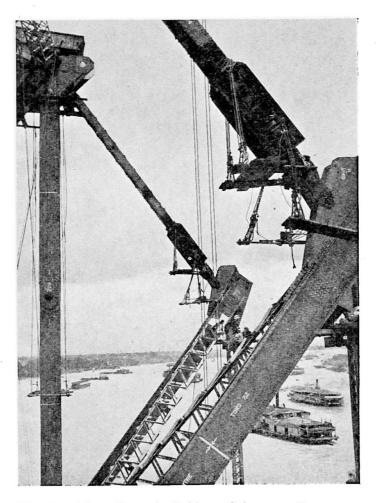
New Howrah Bridge, Calcutta. Temporary adjustable members with 200-ton jacks being used for prestressing of cantilever arm
